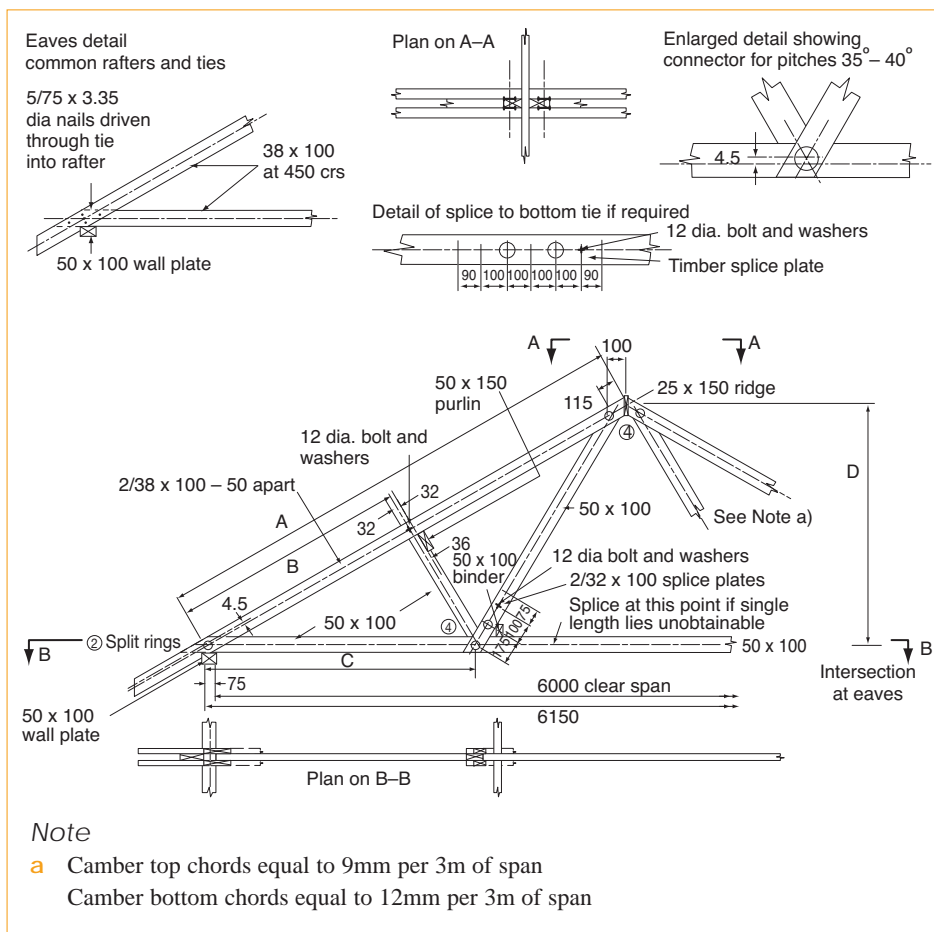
Typical engineered timber truss spanning a 6m domestic roof
